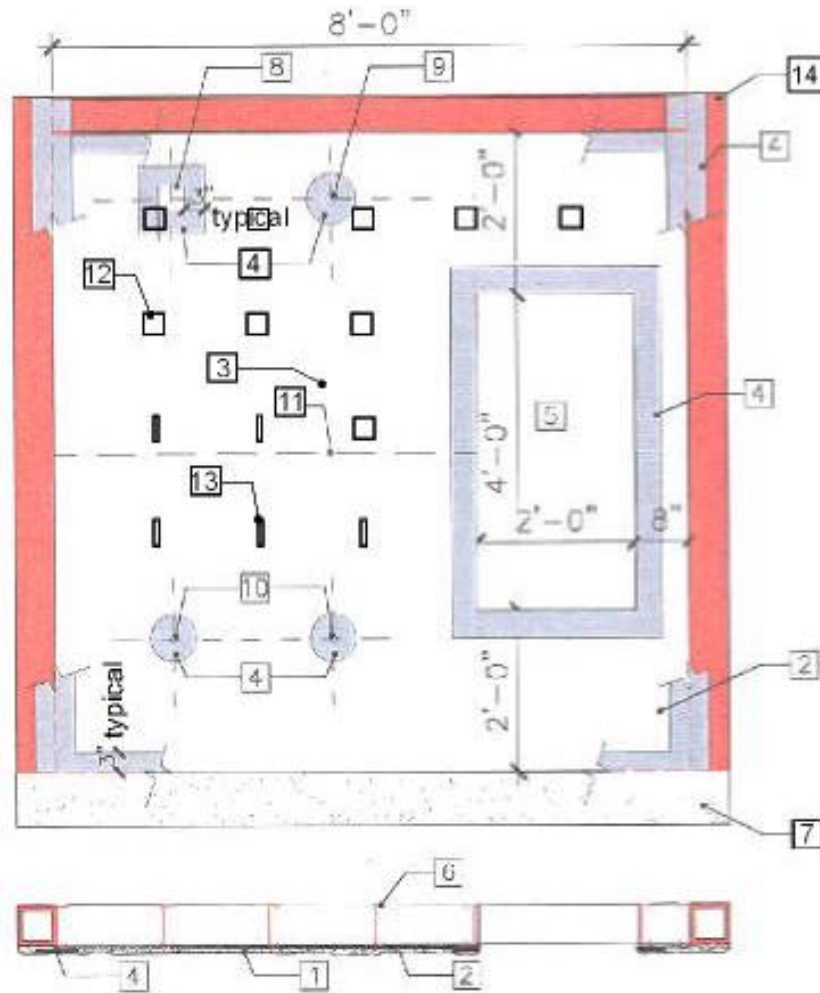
Specimen no. 3^{3/4} Opaque Wall
